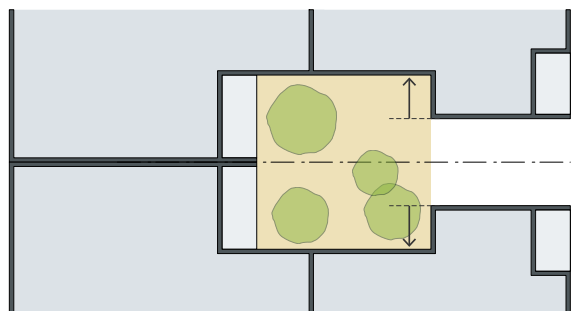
H.4 Where limited setbacks and deep buildings are unavoidable, 'step in' the plan layout to create internal courtyards for improved privacy and daylight access
